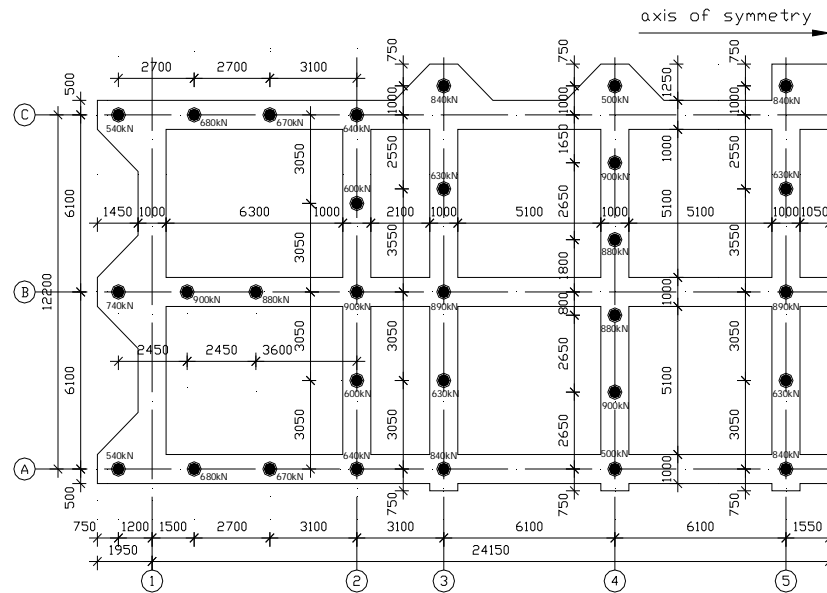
Plan of foundation of the existing 5-story stone apartment building with location of high damping rubber bearings
